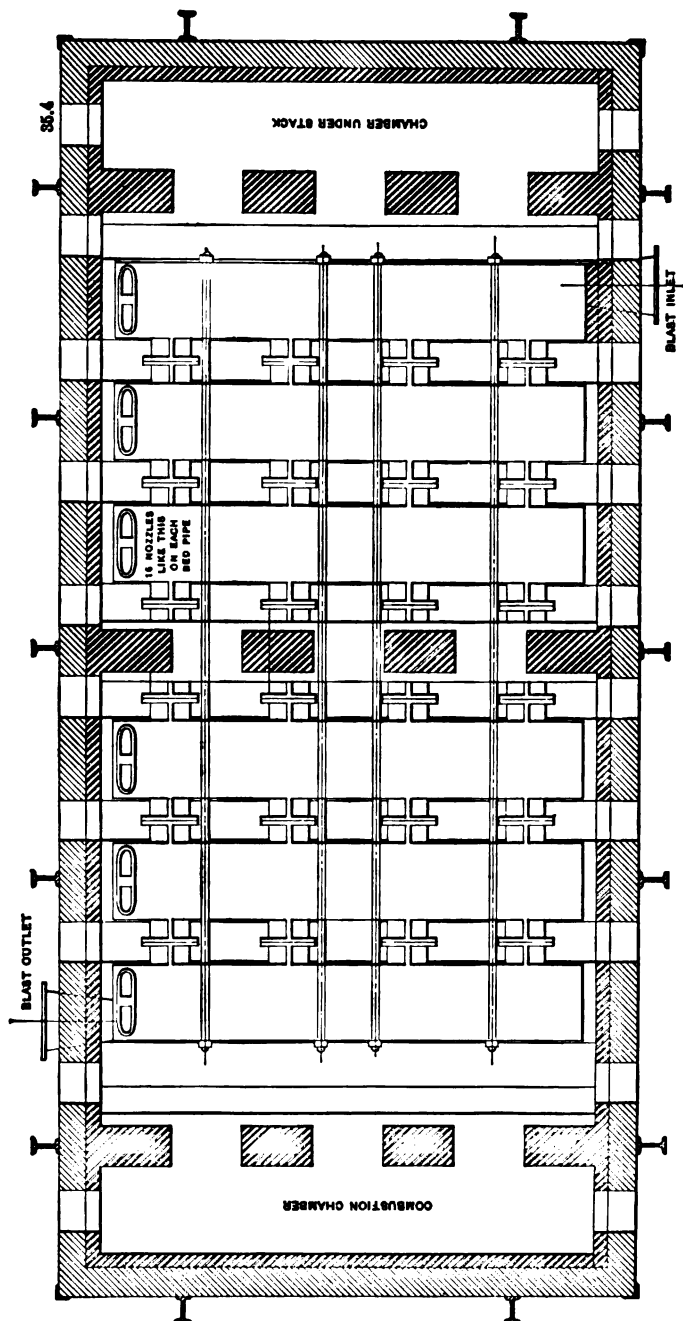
Iron pipe stove, Glendon type; sectional plan.
